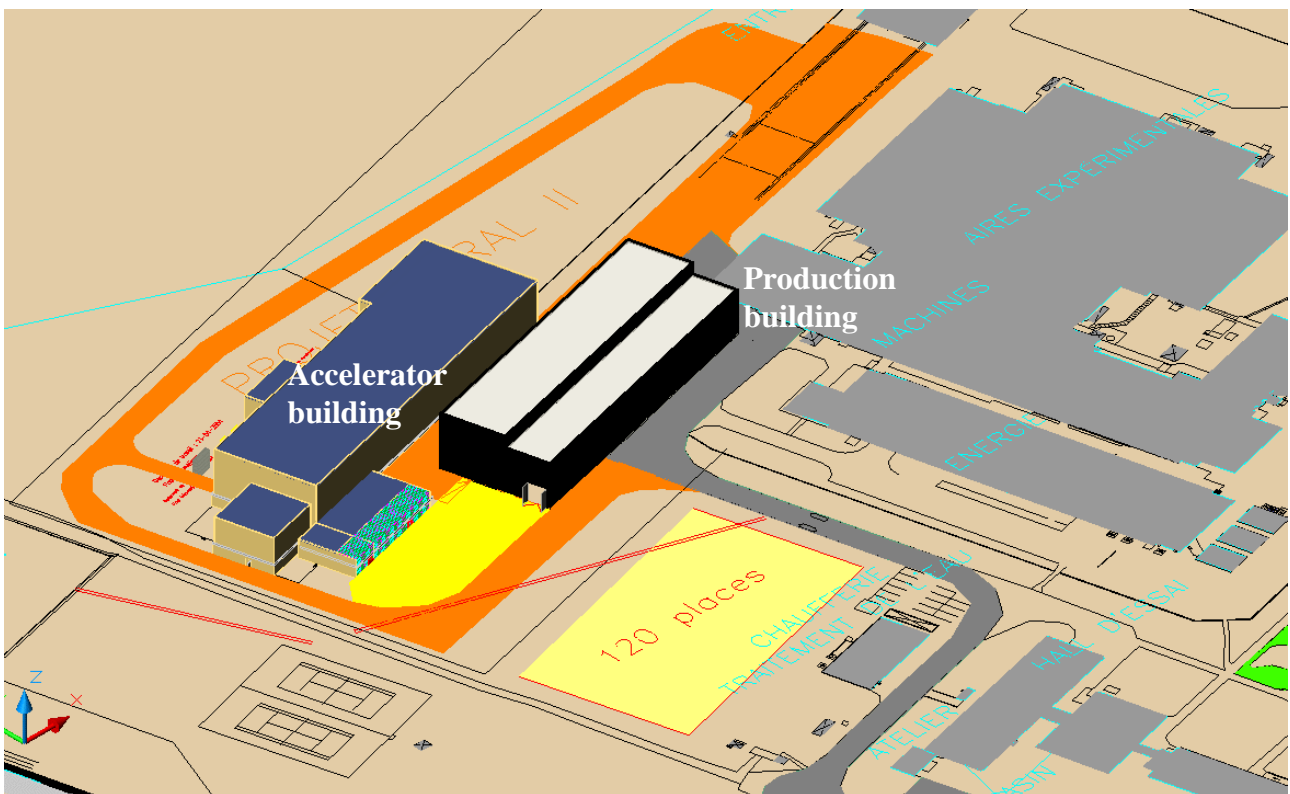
SPIRAL 2 facility on the GANIL site. Proposed new roads are in orange.
